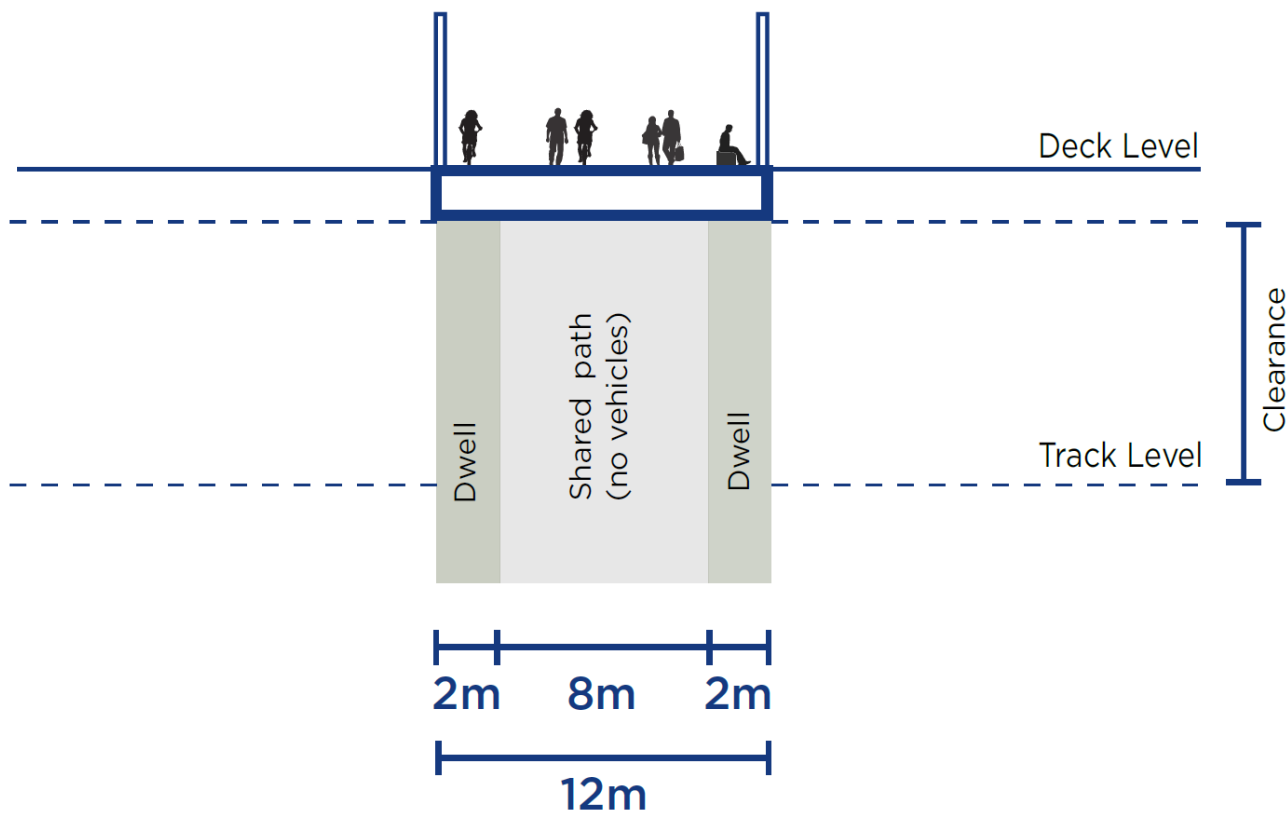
Typical cross-section 9, Prince Alfred Park Bridge
